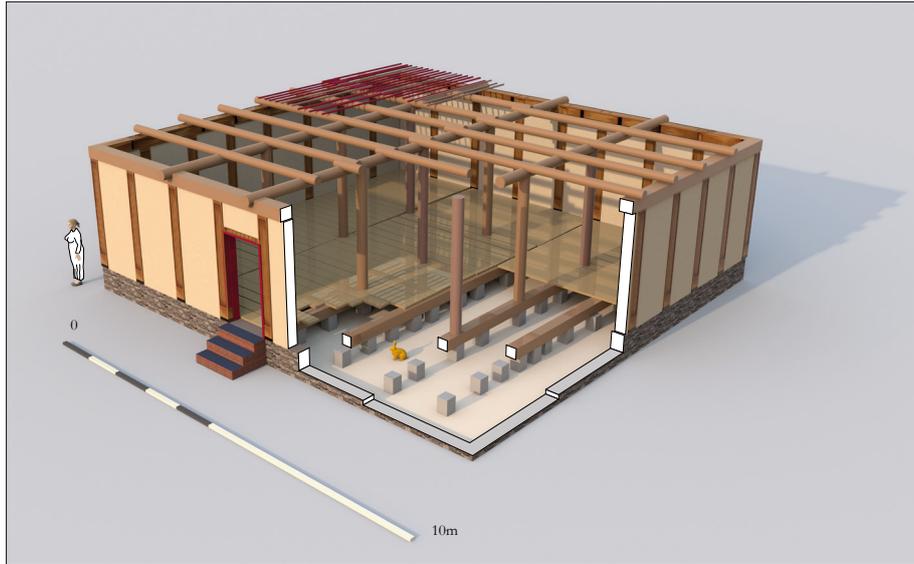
Site P4 - hypothetical reconstruction of the building with its raised floor and timber framed construction.
